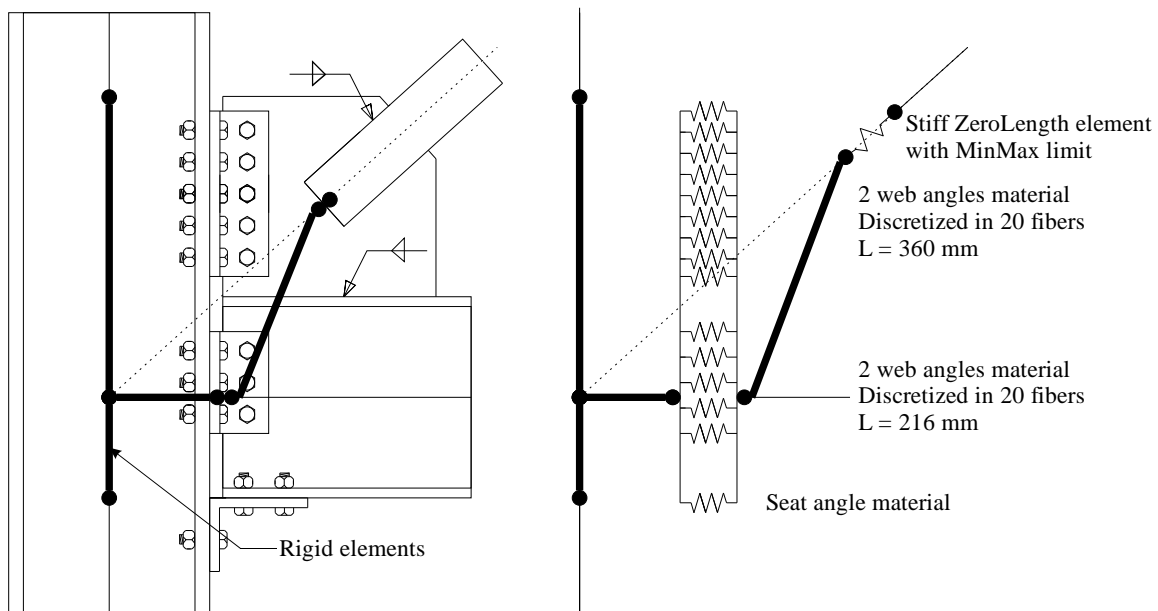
Numerical modeling of typical gusset-beam-column connections
